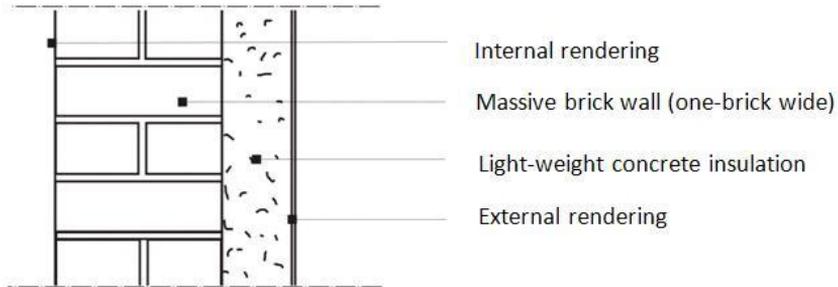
Massive brick wall with internal light-weight concrete insulation. Original structure and renovation with additional thermal insulation.
